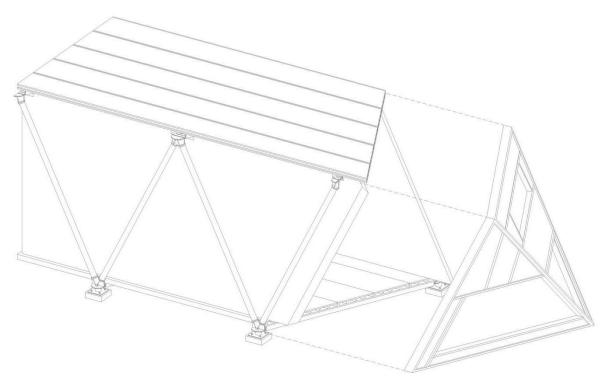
step nine, the structure of the inclined façade is installed in this step
